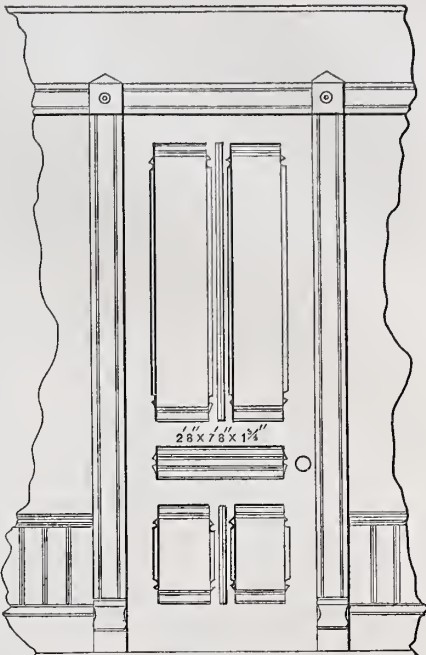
Elevation of Door in Dining-Room.—Scale, $\frac{3}{8}$ Inch to the Foot.
